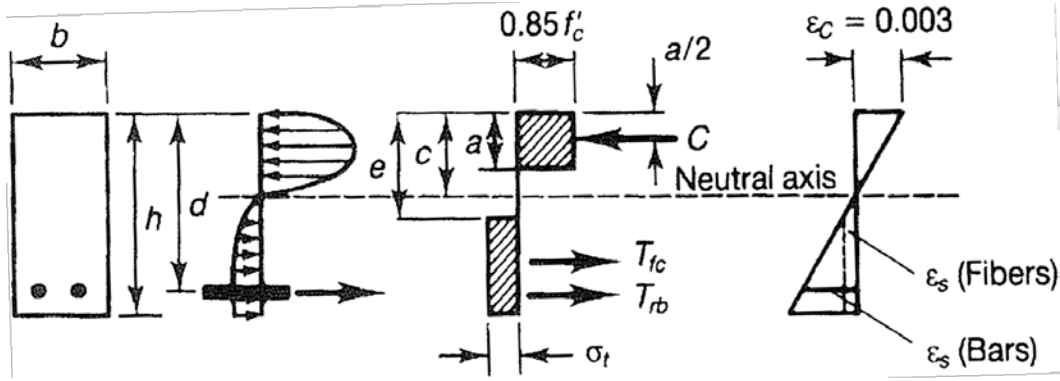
Stress and Strain Distribution across Depth of Singly Reinforced Fibrous Concrete Beam [88]
